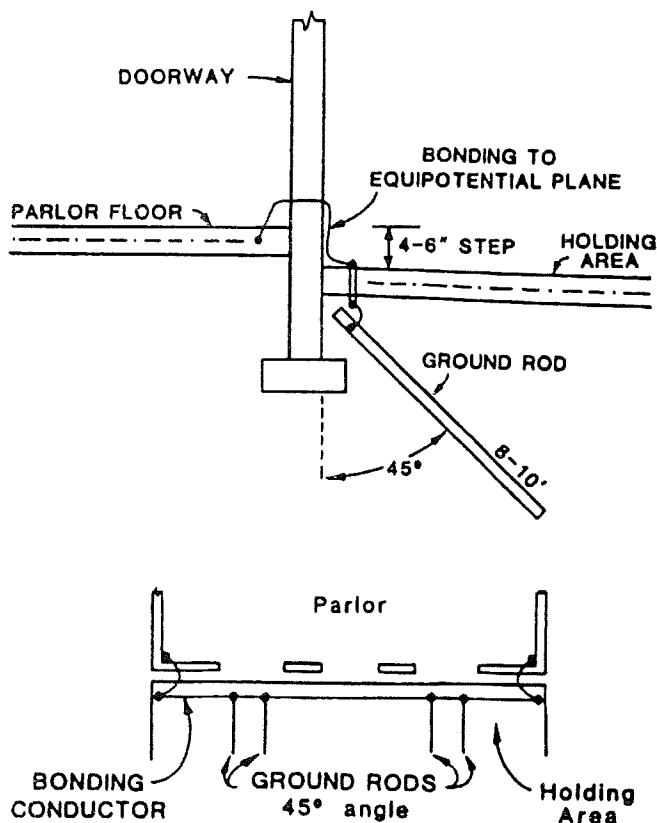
Voltage ramp adjacent to an equipotential plane: top, side view; bottom, frontal view.
